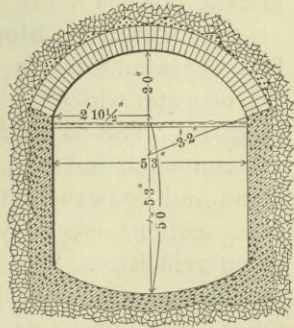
CROSS-SECTION OF TUNNEL, SANTA ANA CANAL.
